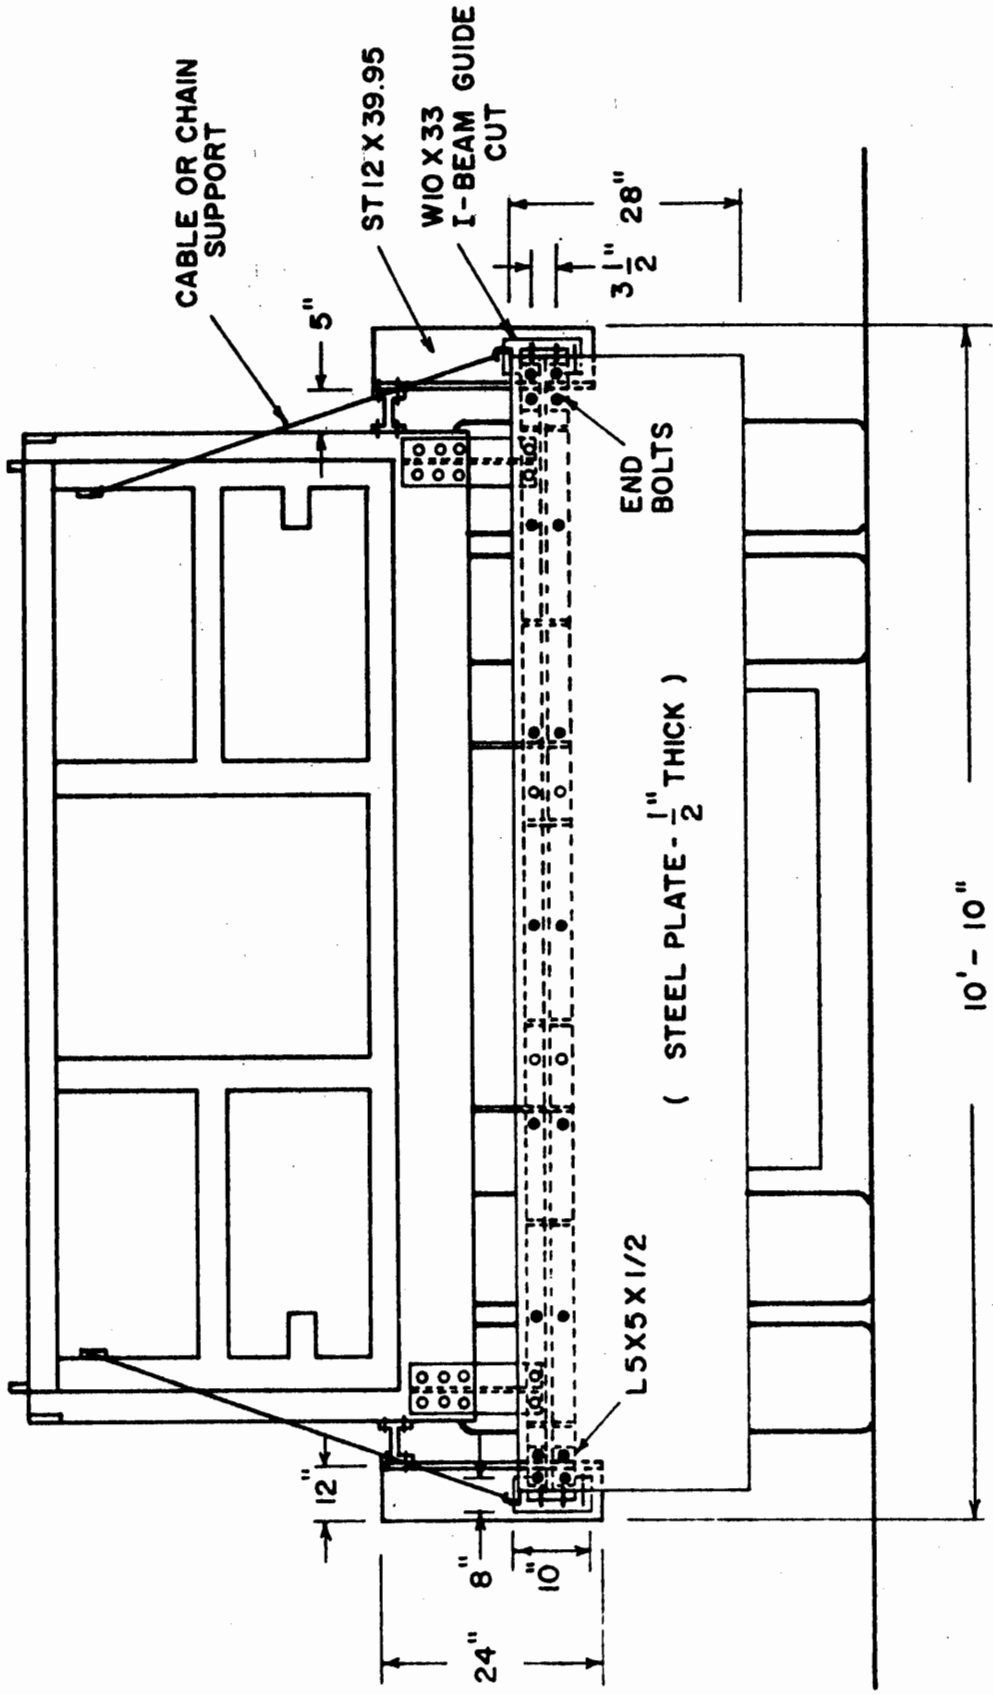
FULL ASSEMBLY - REAR VIEW (•-3/8" φ HEX HEAD BOLTS)
